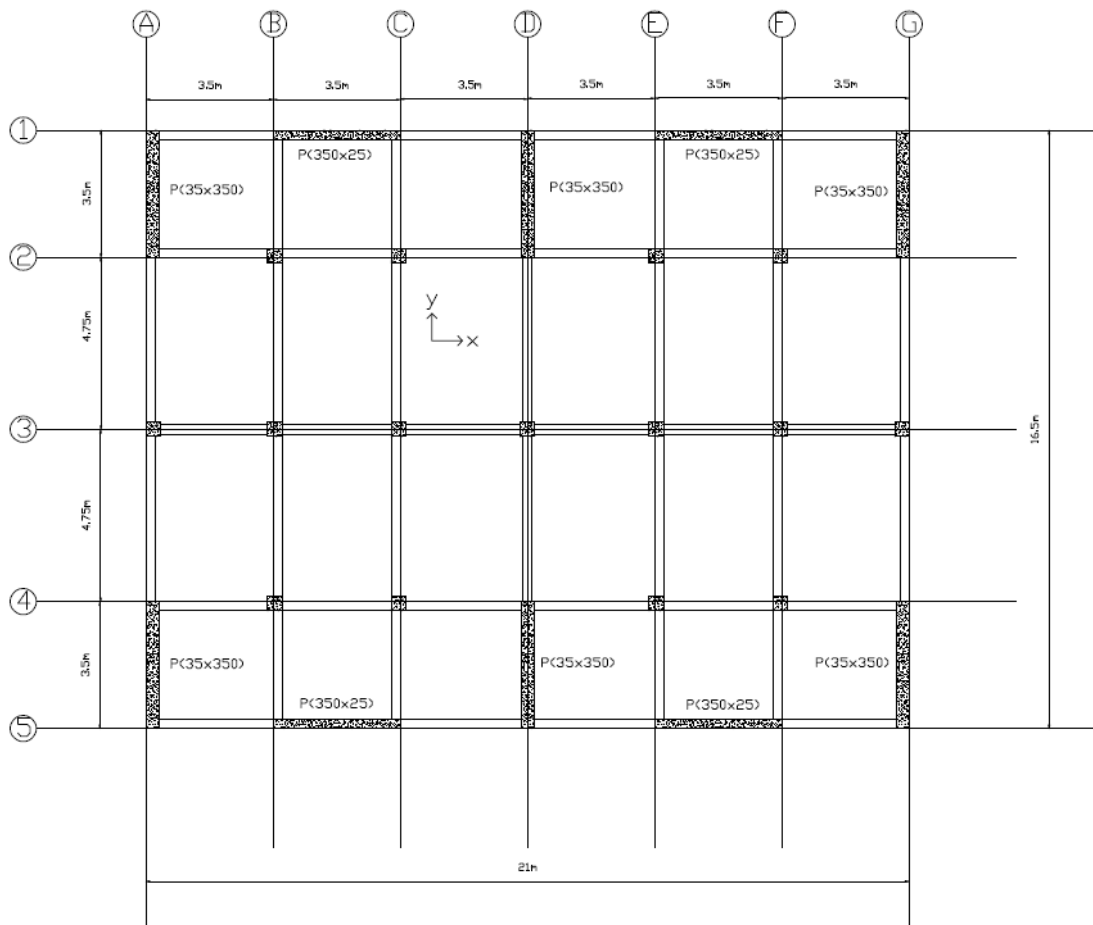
Plan of Model 8 with Wall Area to Floor Area Ratio of 1.0% in X-direction and 2.0% in Y-direction
